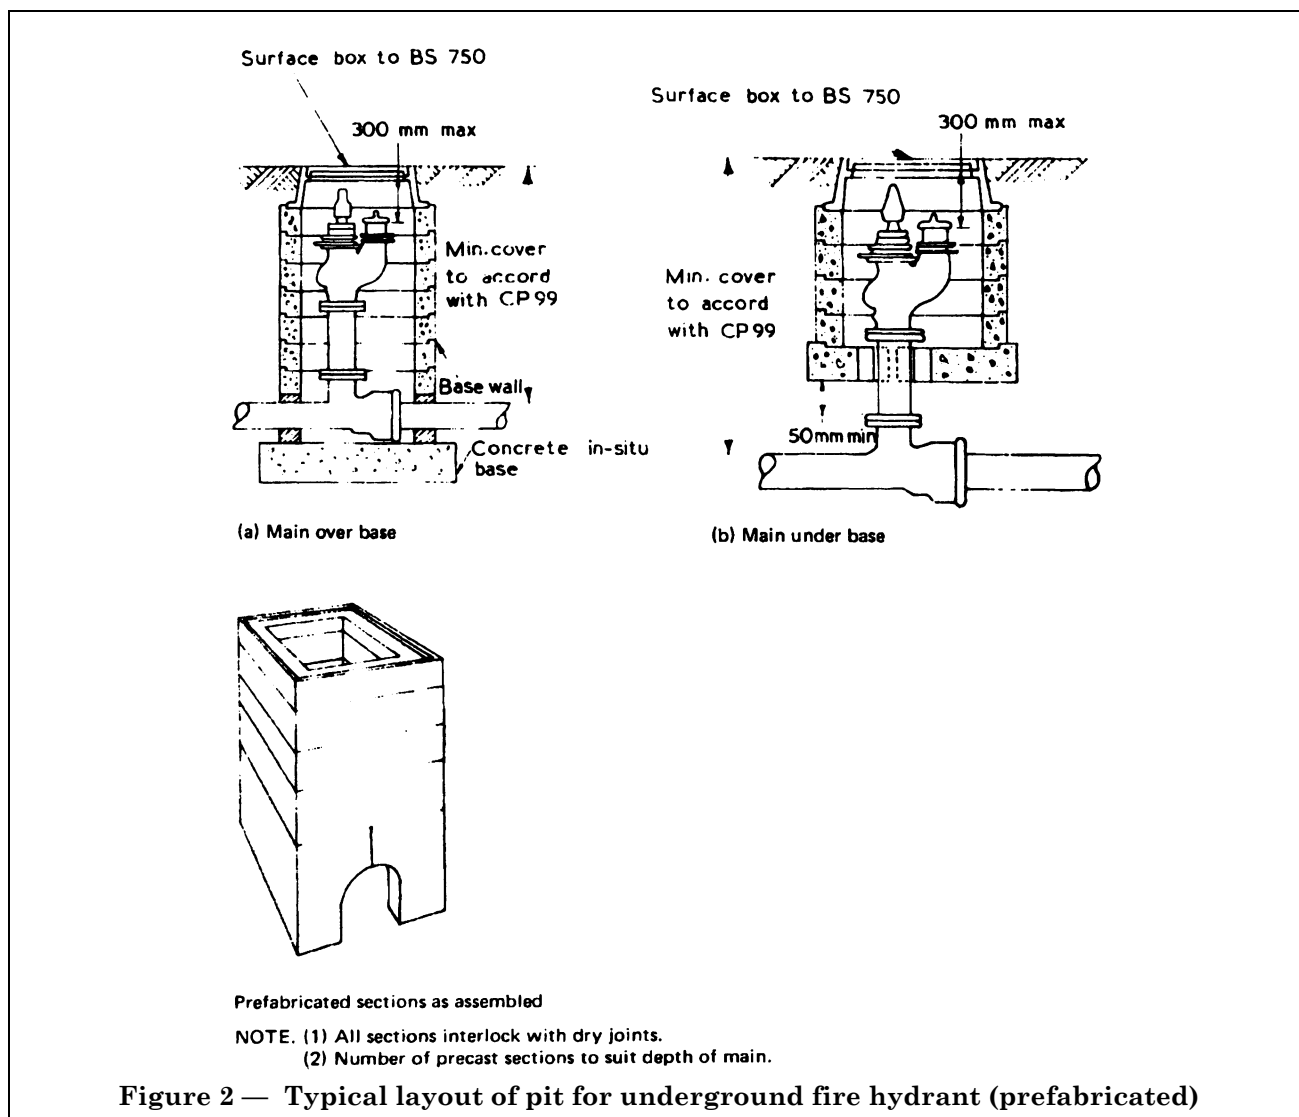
Typical layout of pit for underground fire hydrant (prefabricated)
